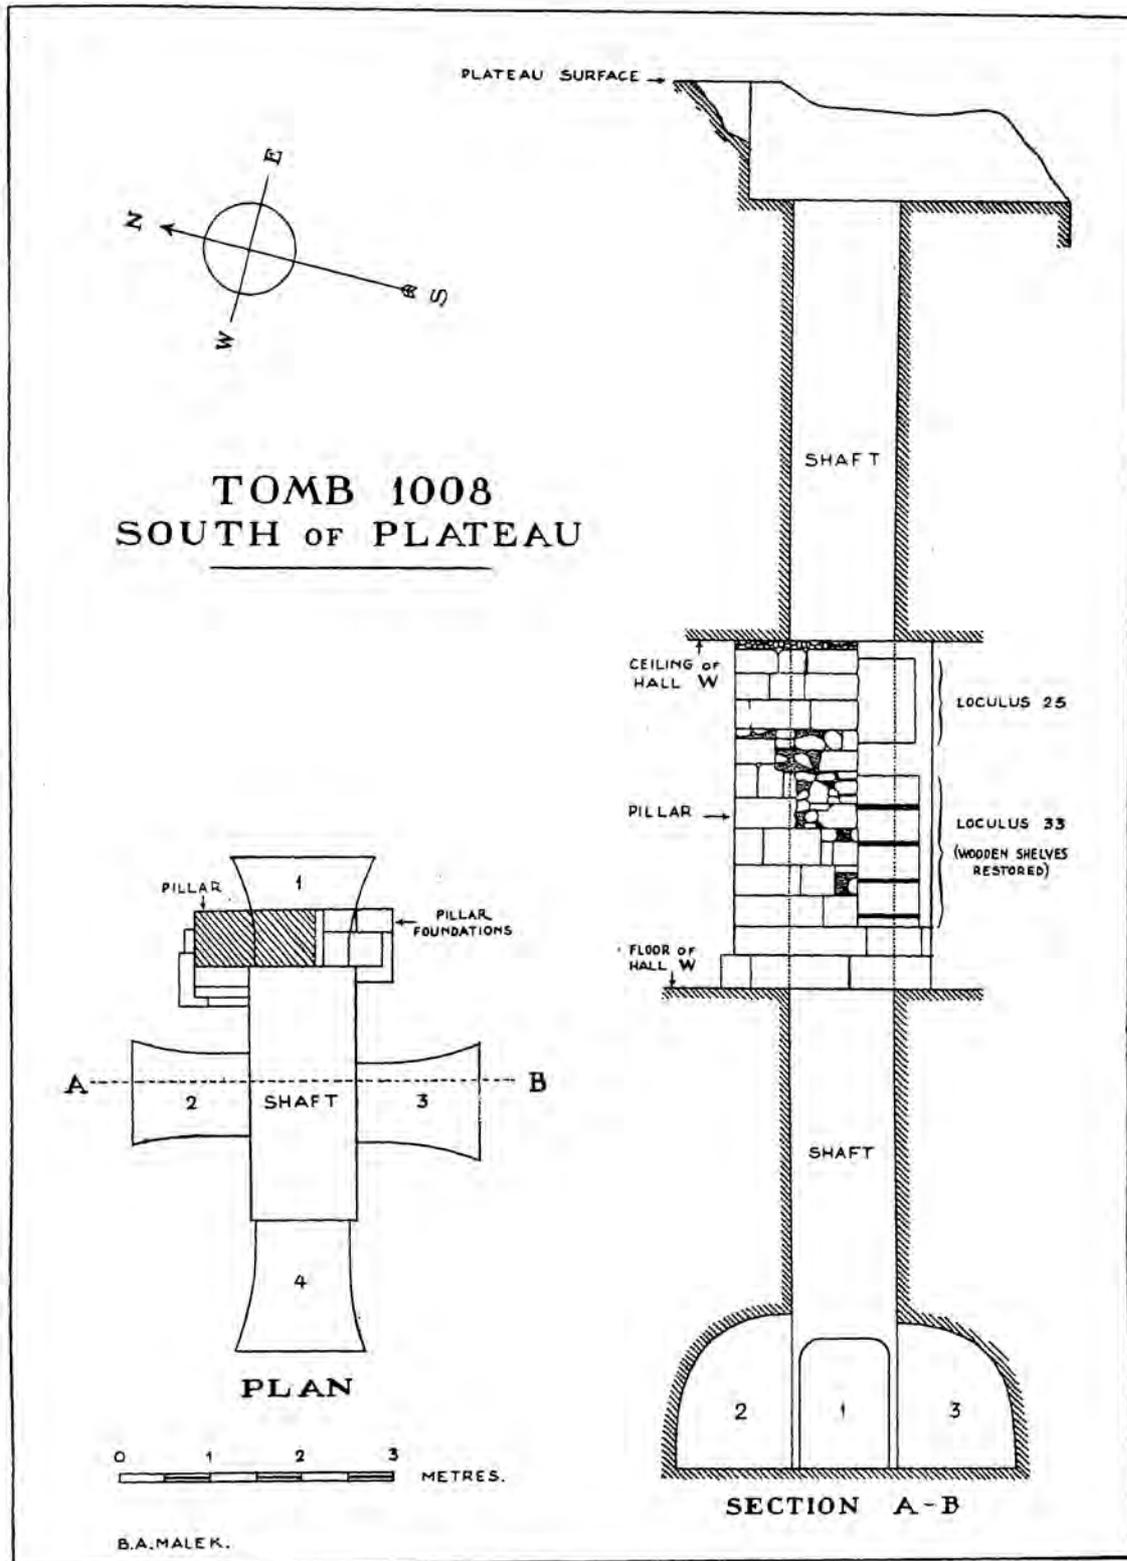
Plan and section of Tomb 1008. Plan digitized after Rowe 1942:PLXII; see Figure 88.
